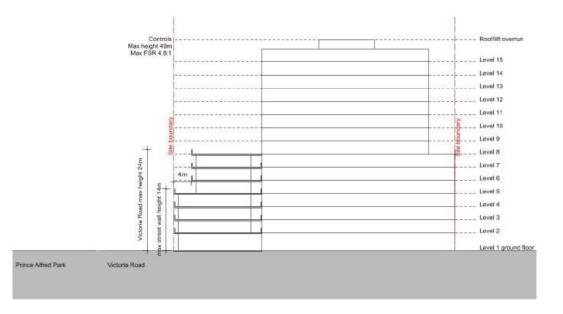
4.3.3.6.4 North - South Section of Site Building Envelope
